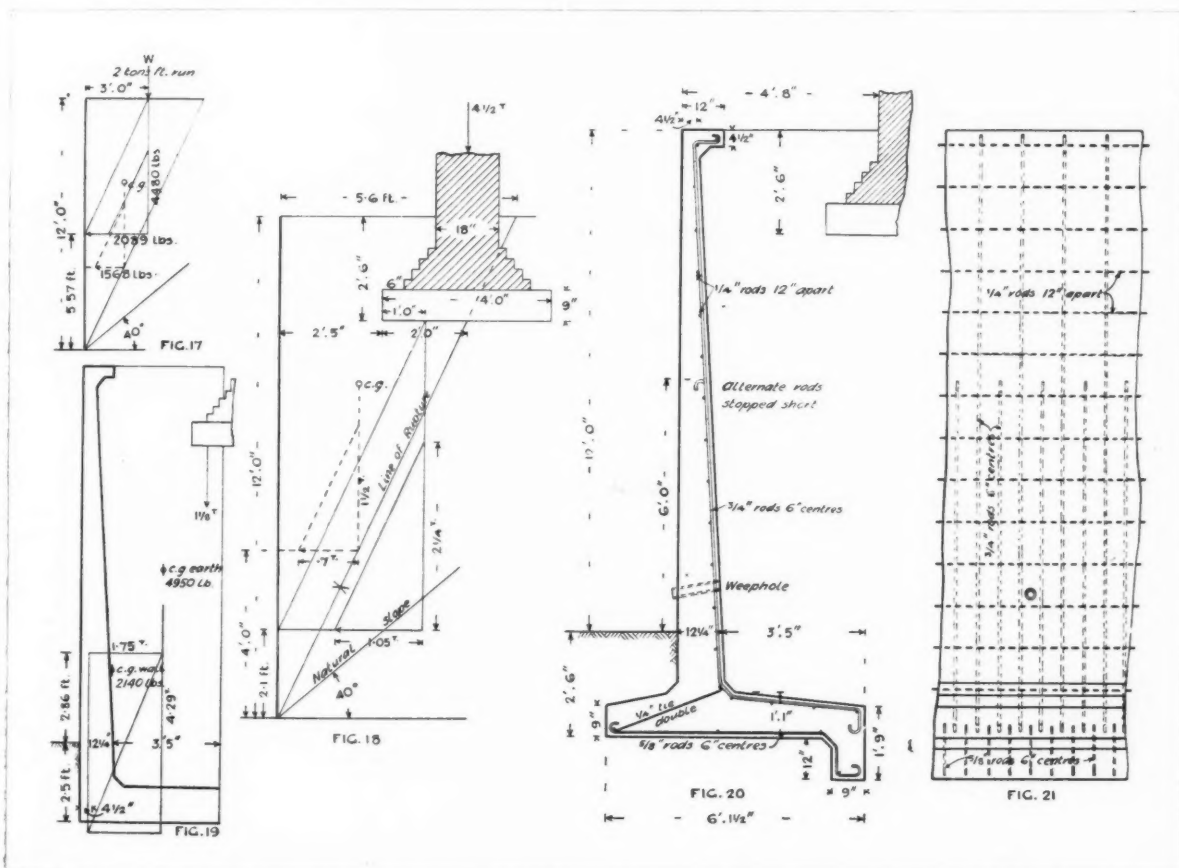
Load on rail behind wall. Fig. 18. Building foundation behind wall. Fig. 19. Position of final resultant. Fig. 20. Complete section of wall. Fig. 21. Part back elevation of wall.
